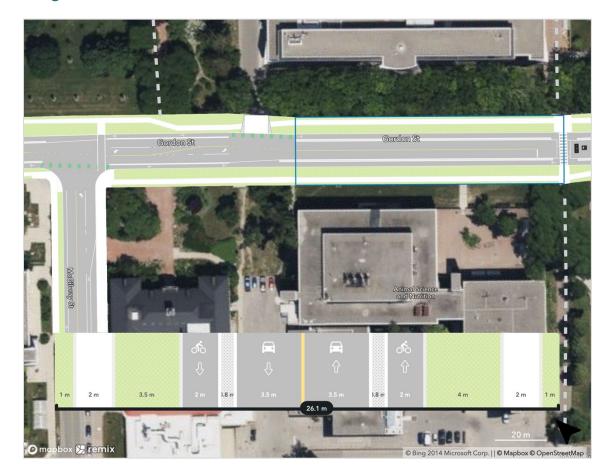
Design Option 1 Example between South Ring Road and the Speed River Bridge
